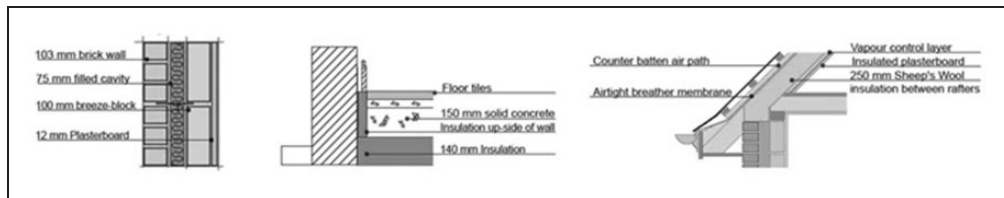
Construction details for walls (left), ground floor (middle) and roof (right).
